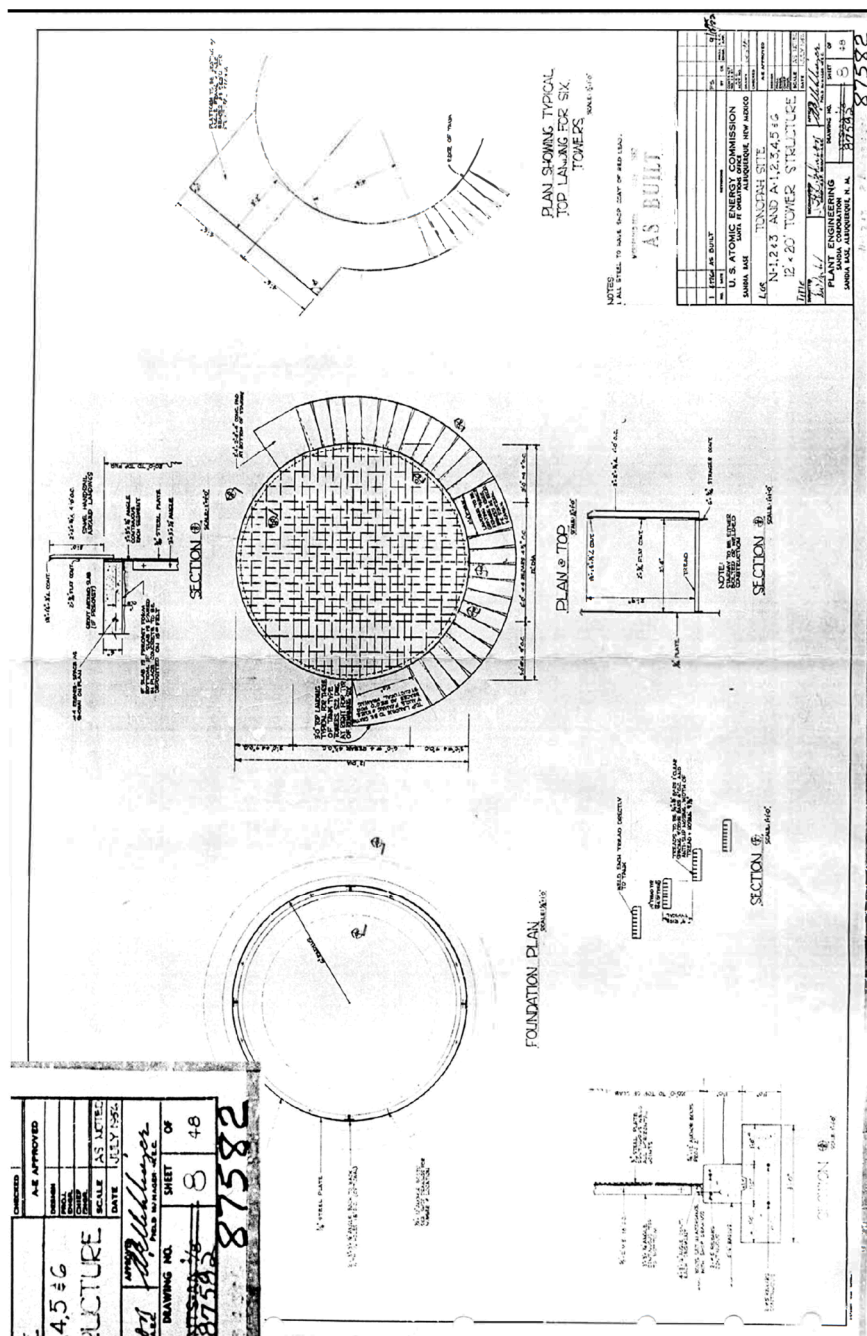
Plant Engineering, "N-1, 2 & 3 and A-1, 2, 3, 4, 5 & 6, 12' x 20' Tower Structure, Tonopah Site," Drawing 87582, Sheet 8 of 48, July 1956.
